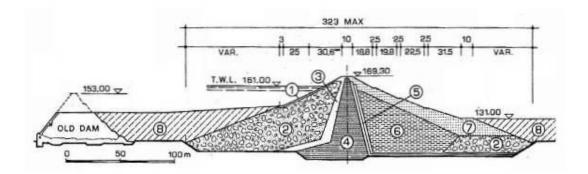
Disueri dam: vertical cross section of the new and old structures
